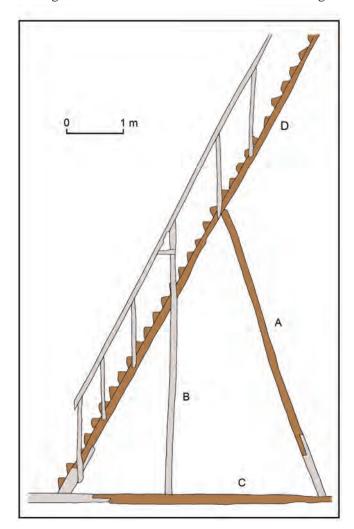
St Mary, Brabourne (Kent). Fourteenth-century timber ladder-stair in the ground-stage of the tower. Secondary timbers and repairs are shown in light tone. A, strut supporting the carriages. B, added strut and balustrade. C, sill-beam. D, pair of carriage timbers supporting treads. Gardiner et al. 2003–05
